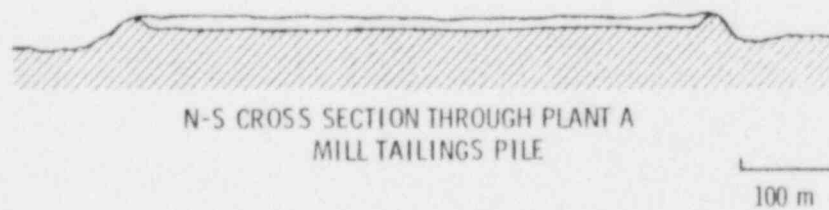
North-South Cross Section Through Tailings Pile, Site A
